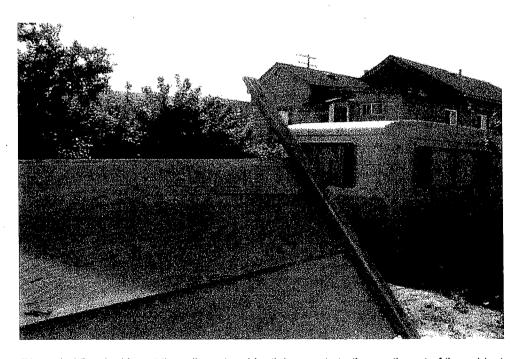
View looking at the adjacent residential property to the southwest of the subject property.
